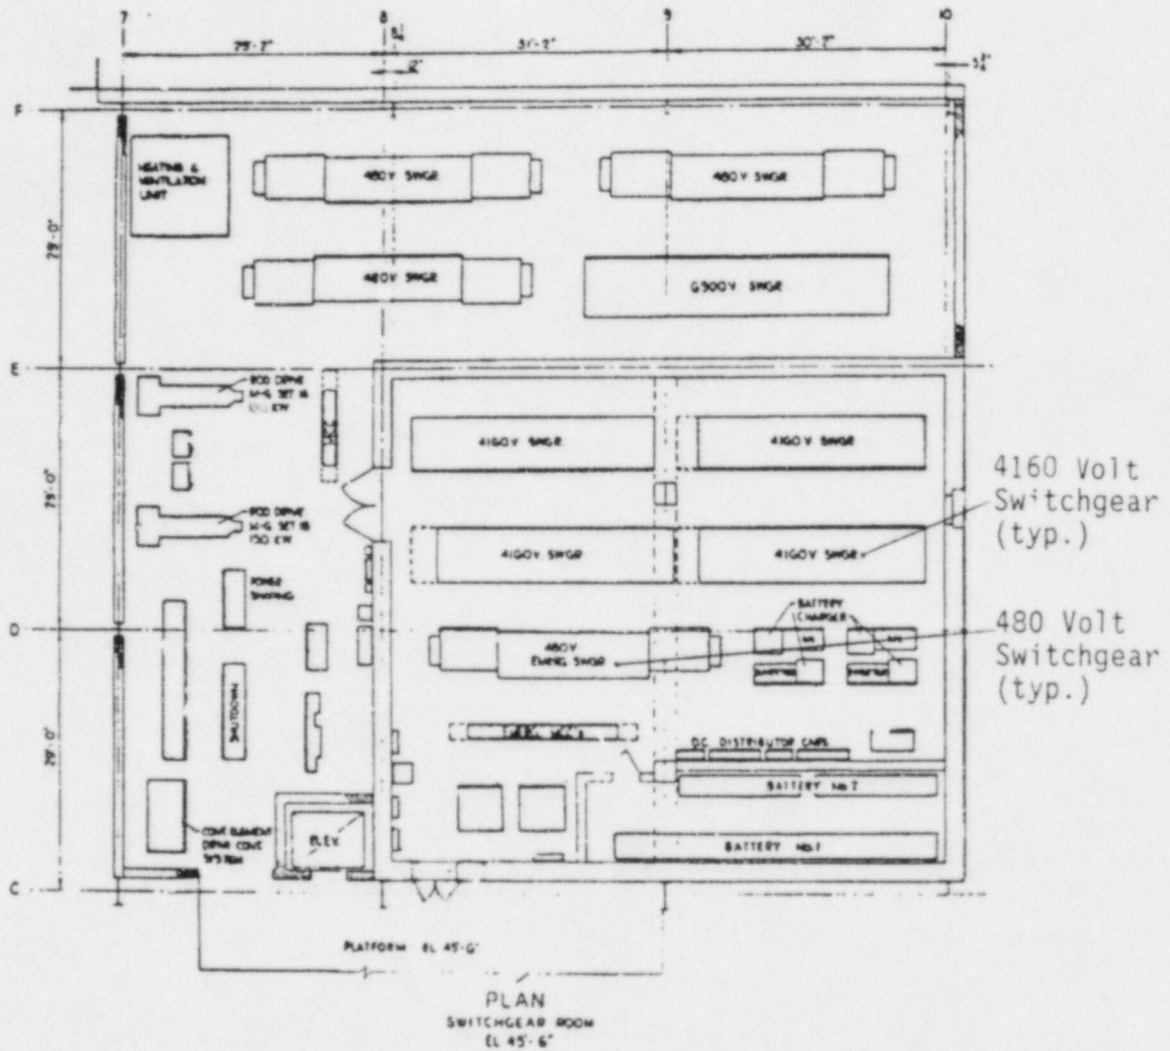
Plan of Switchgear Room Showing Critical Equipment Locations.
